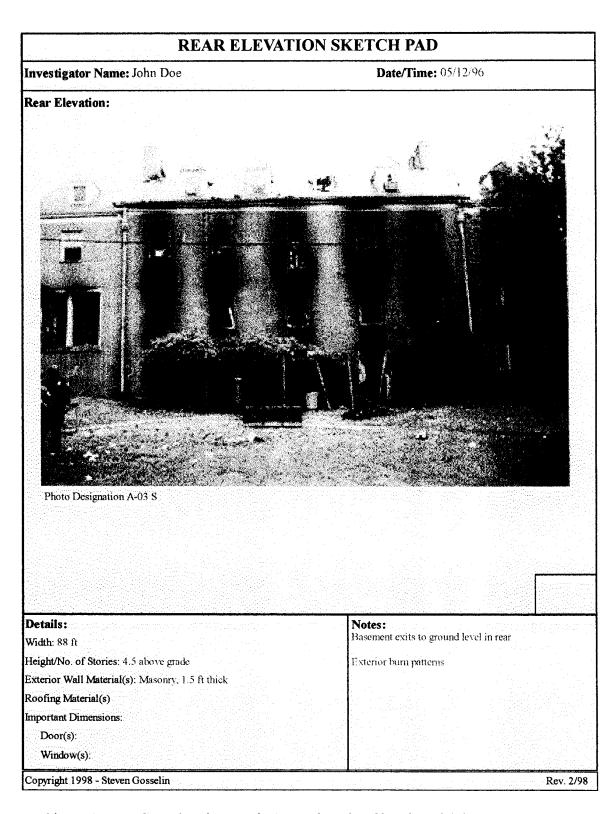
F – Completed example Rear Elevation Sketch Pad (Photo ©NFPA Fire Investigations Department. Used with permission. 78)
